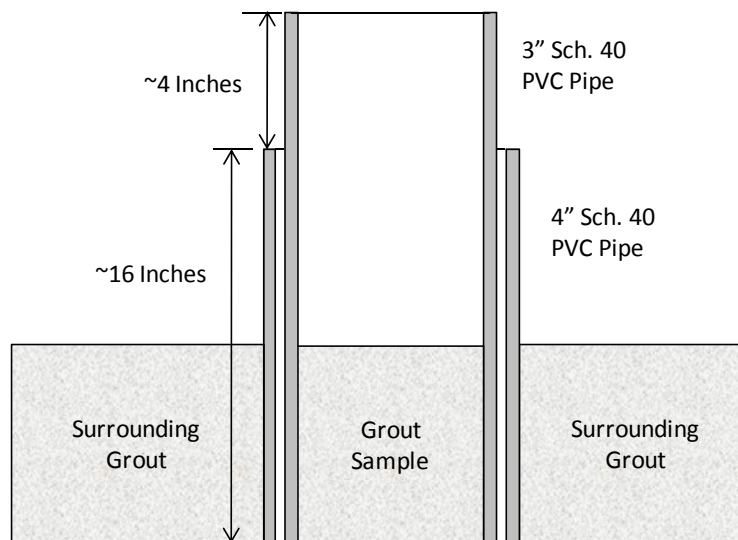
Section view of the pipe-in-pipe sampling assembly
